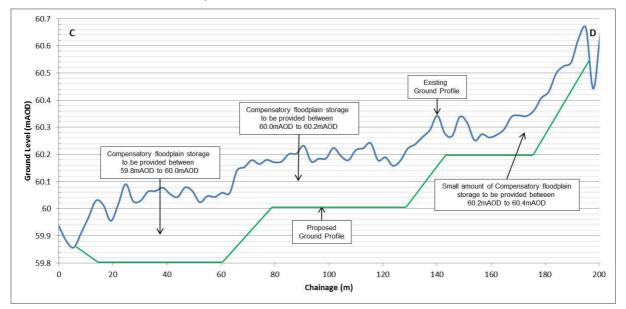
Higher Level Storage Indicative Cross Section (Set to Cross Sections Locations shown in Figure 15).
